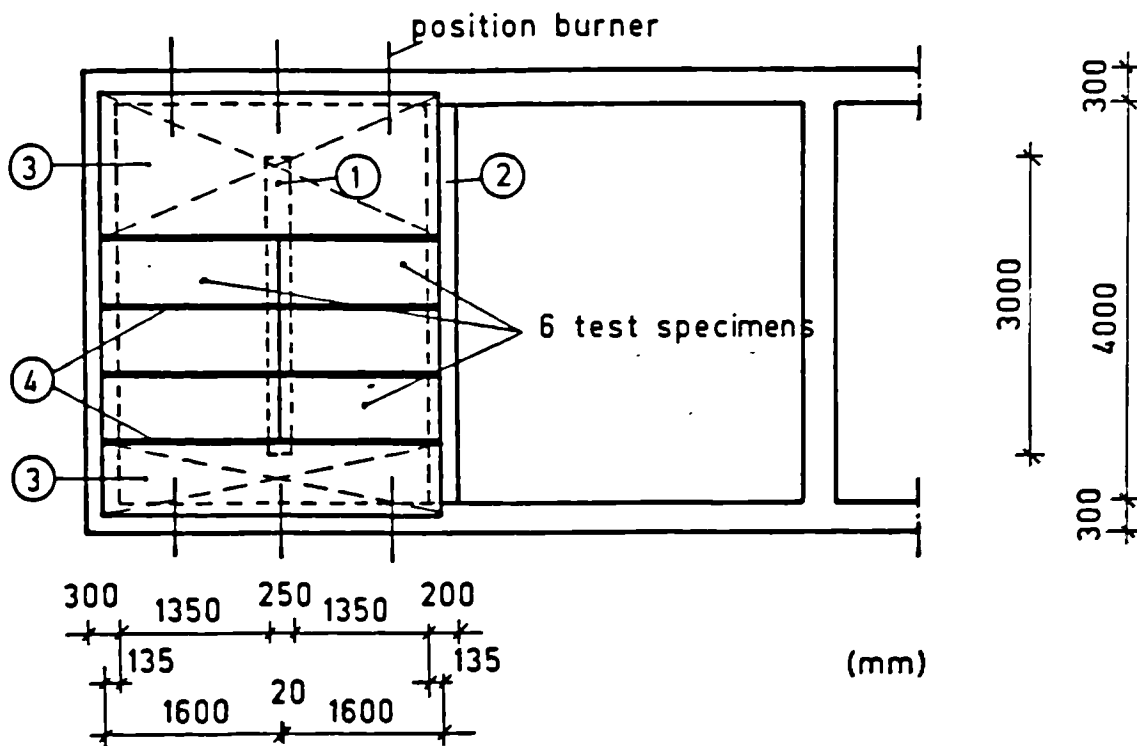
Schematic Review of the Harr's Test Arrangement [8.3]
